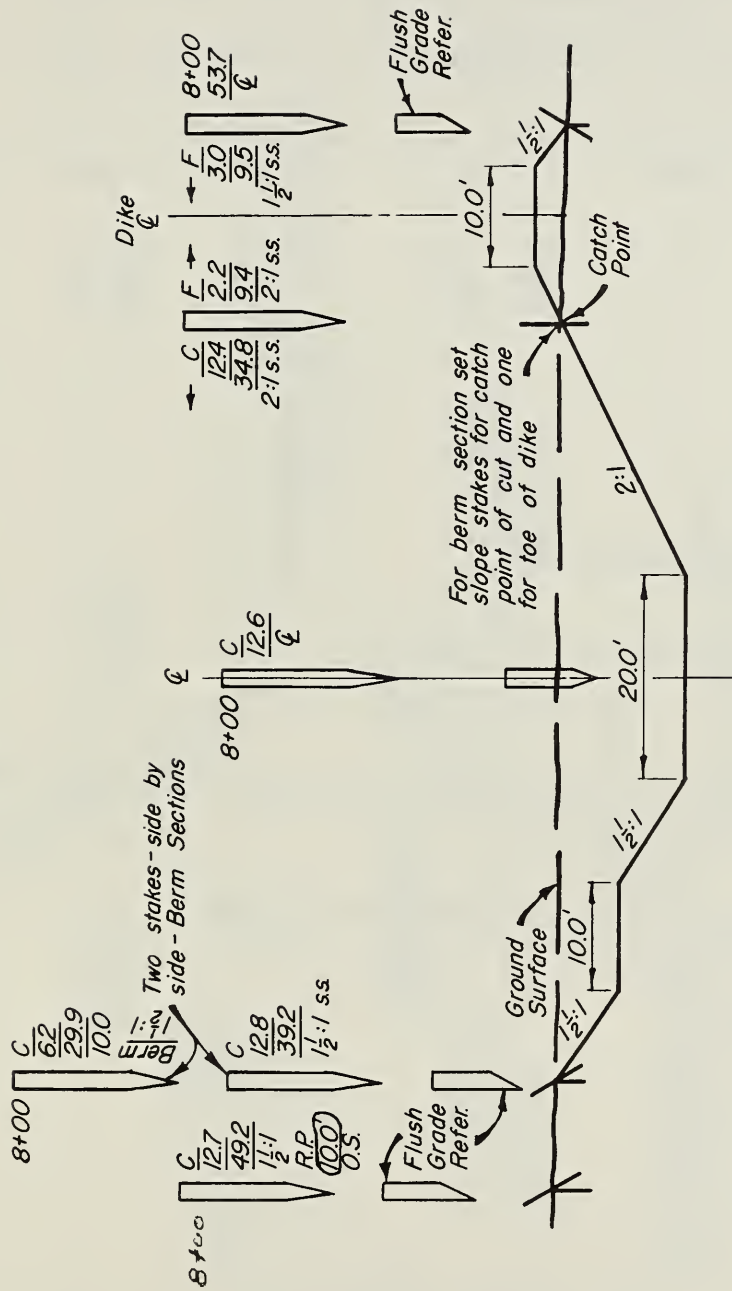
EXAMPLE FOR STAKING EXCAVATIONS
